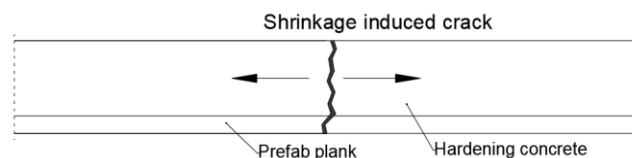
Cracking of both prefab plank and in-situ cast concrete.
